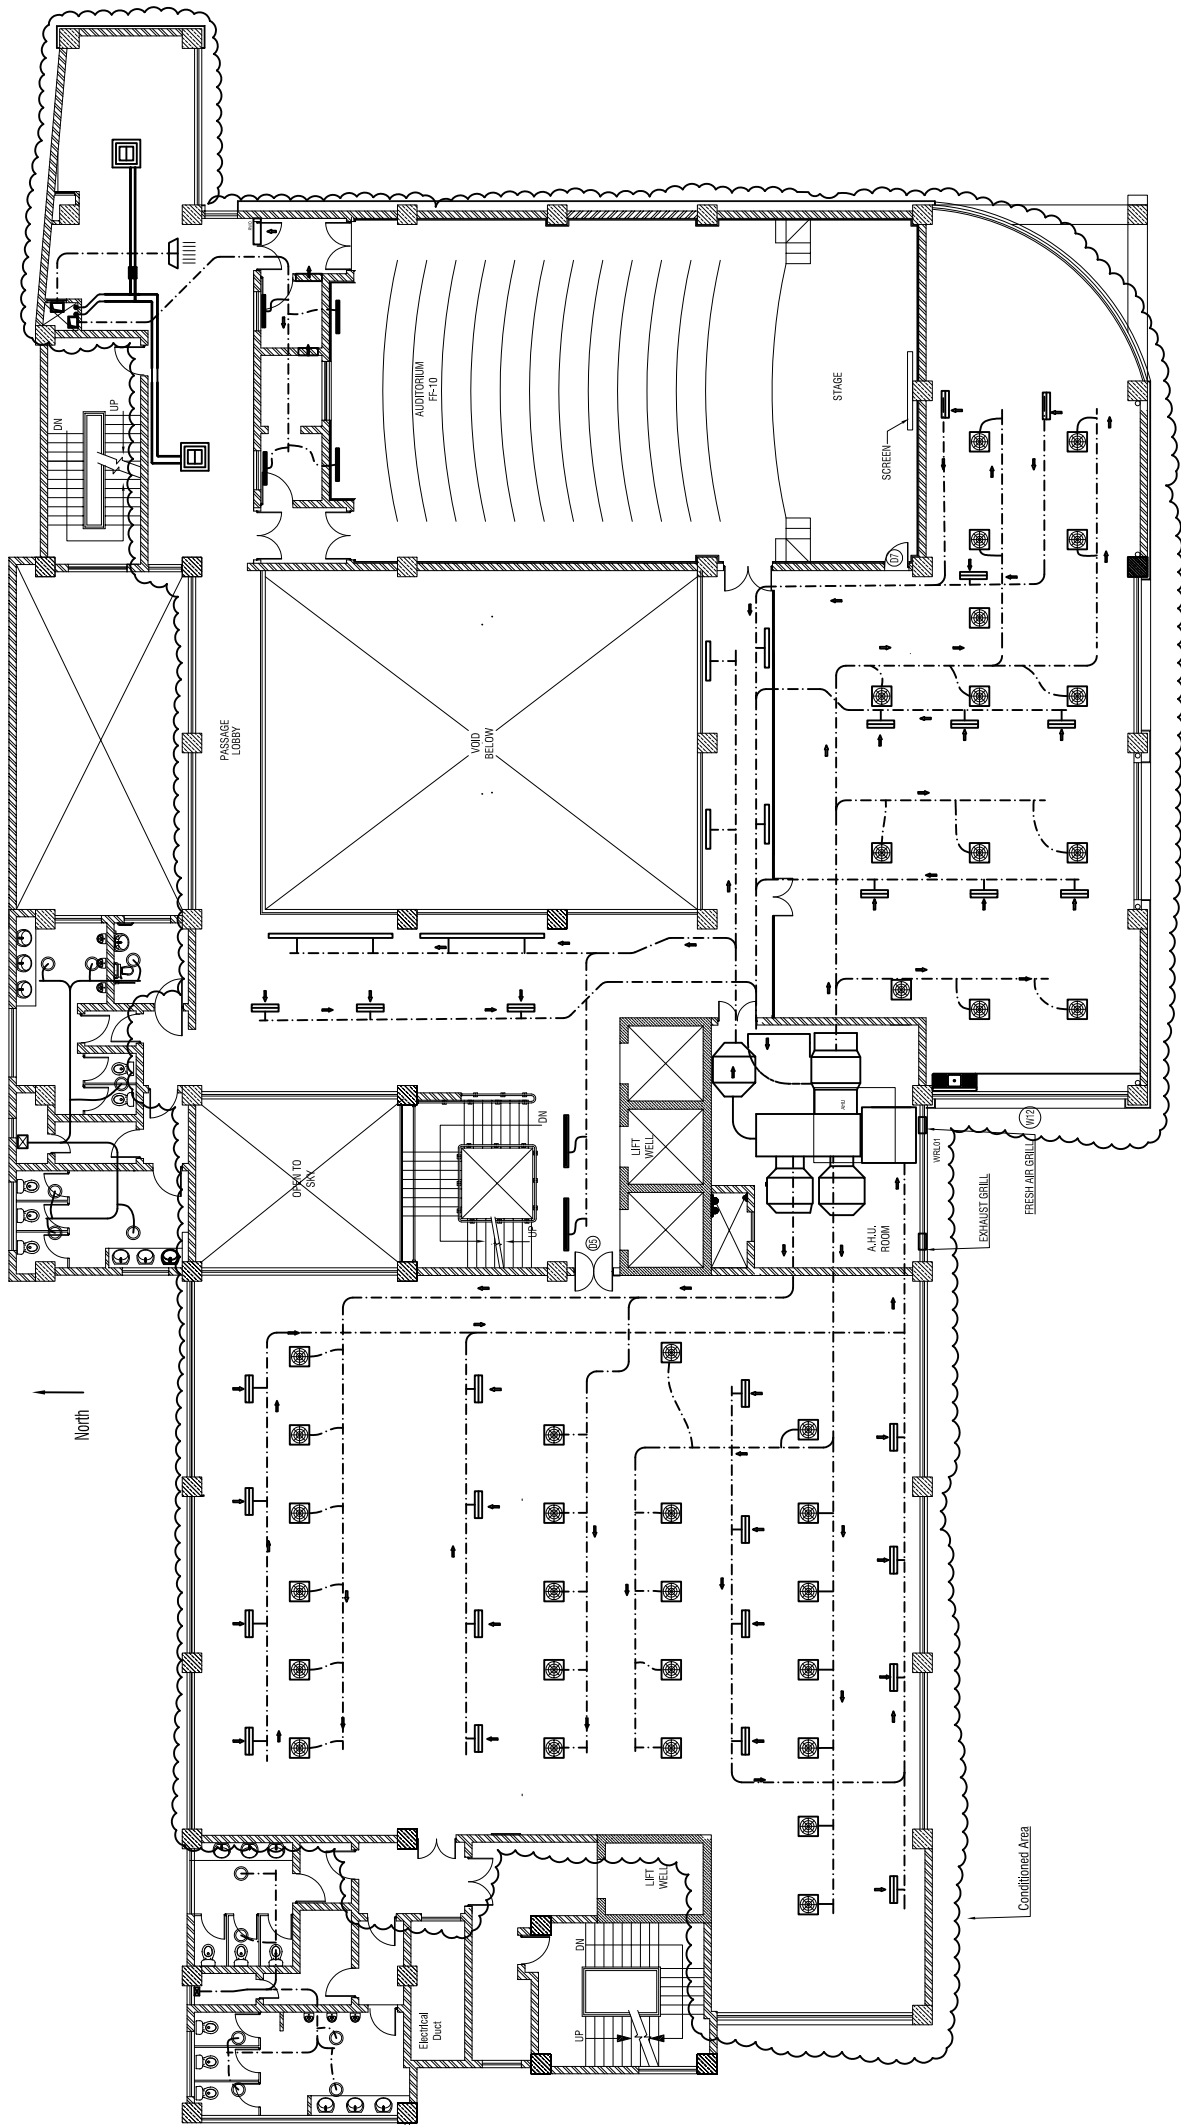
Ceylon Petroleum Corporation Head Office Building - First Floor
